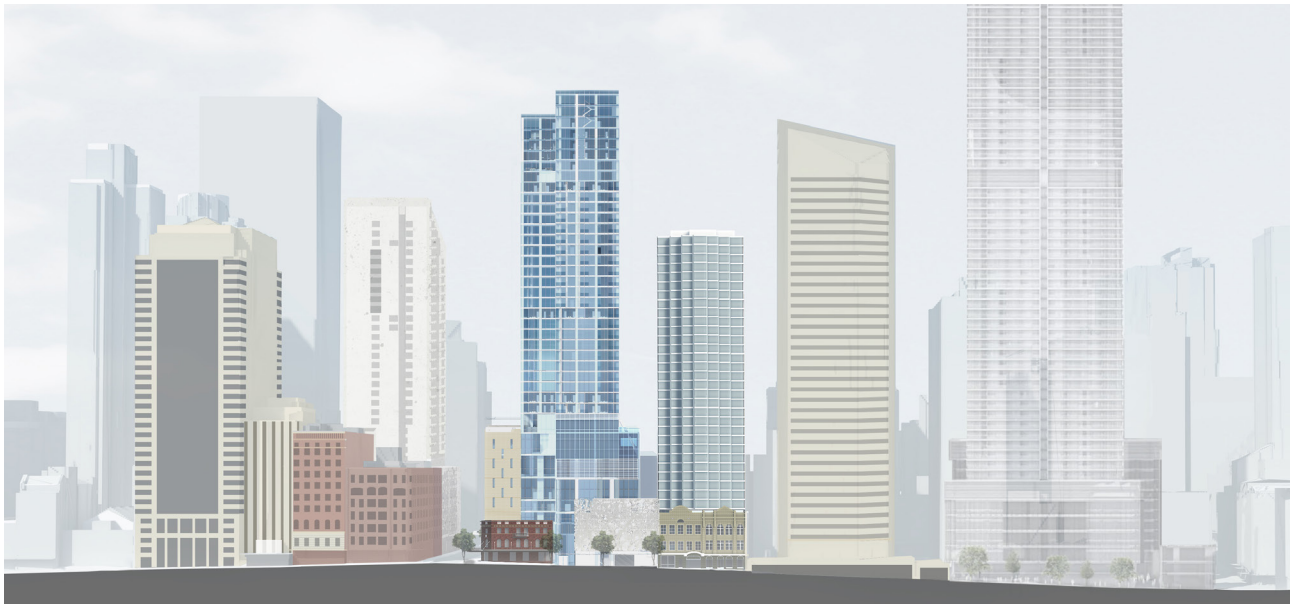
Indicative Over Station Development Design Response - Pitt Street Elevation
